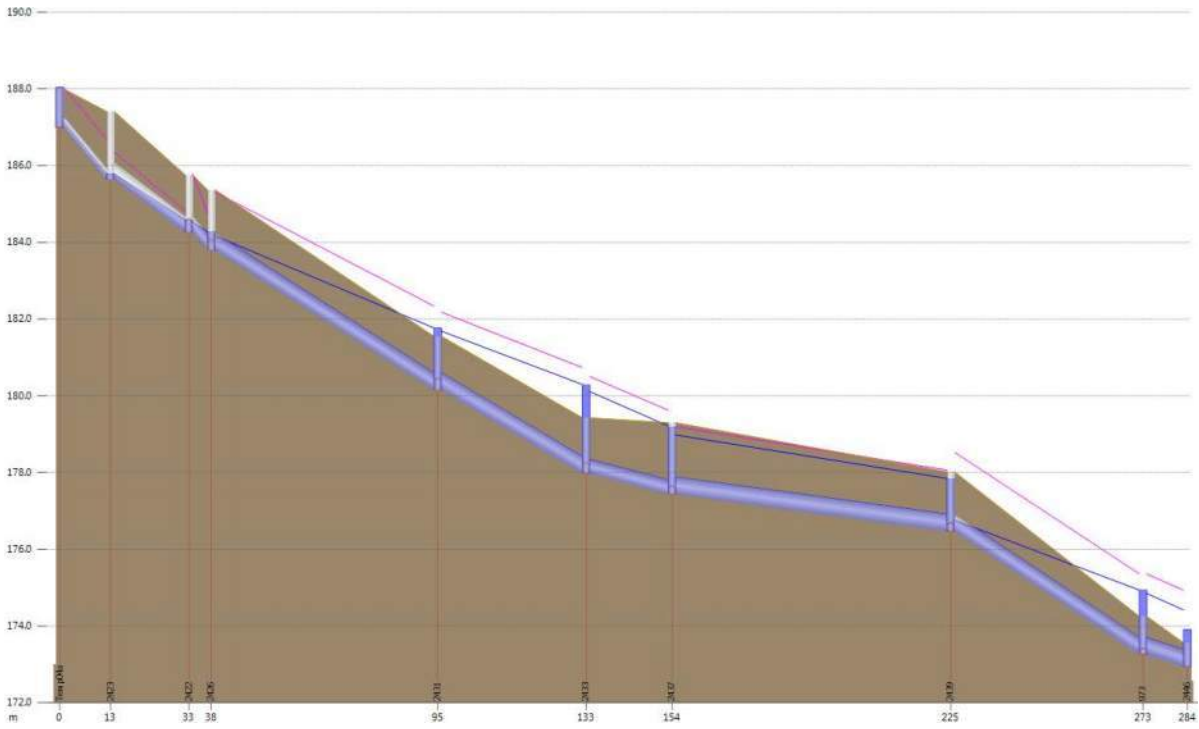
20 yr 1 hr Long section from top of Buell Drive to outlet headwall (post-development)
